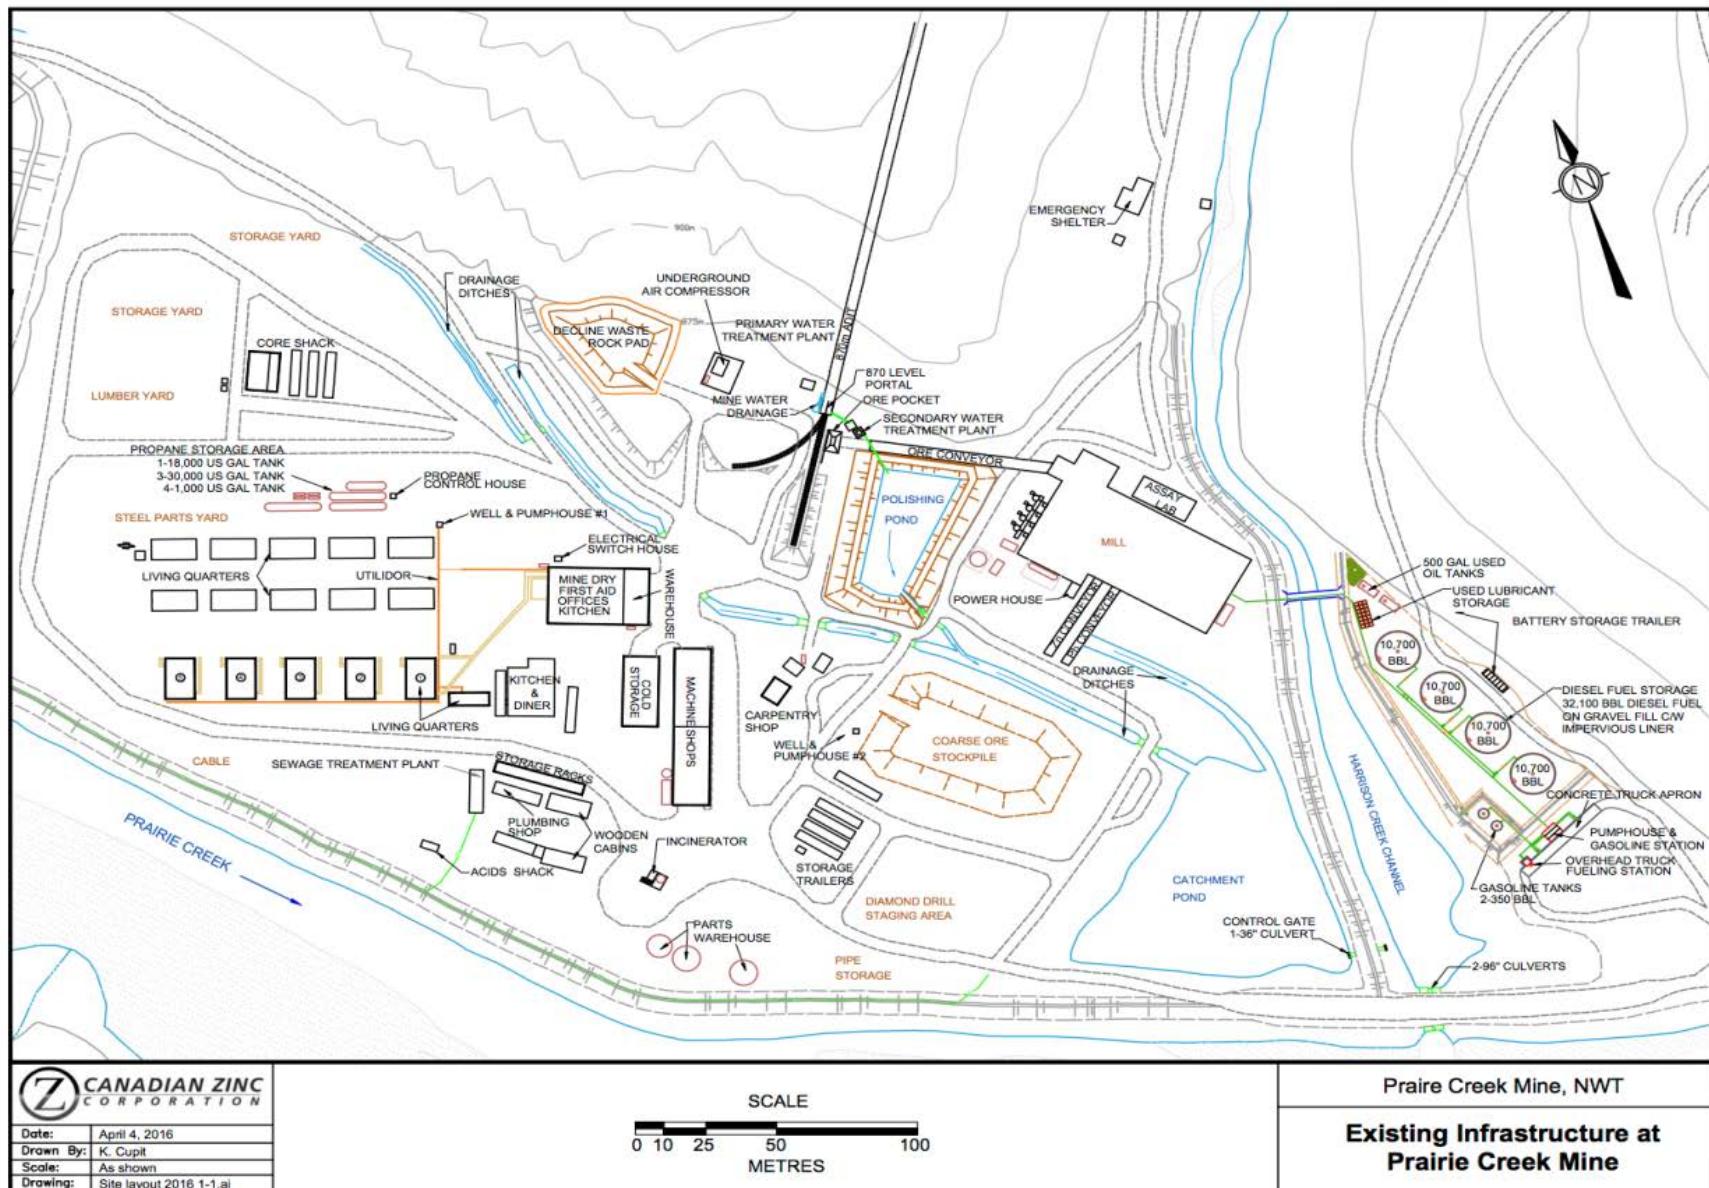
is a plan view of the existing site layout. Figure 18.3 shows the proposed general arrangement for modified infrastructure at the site.
